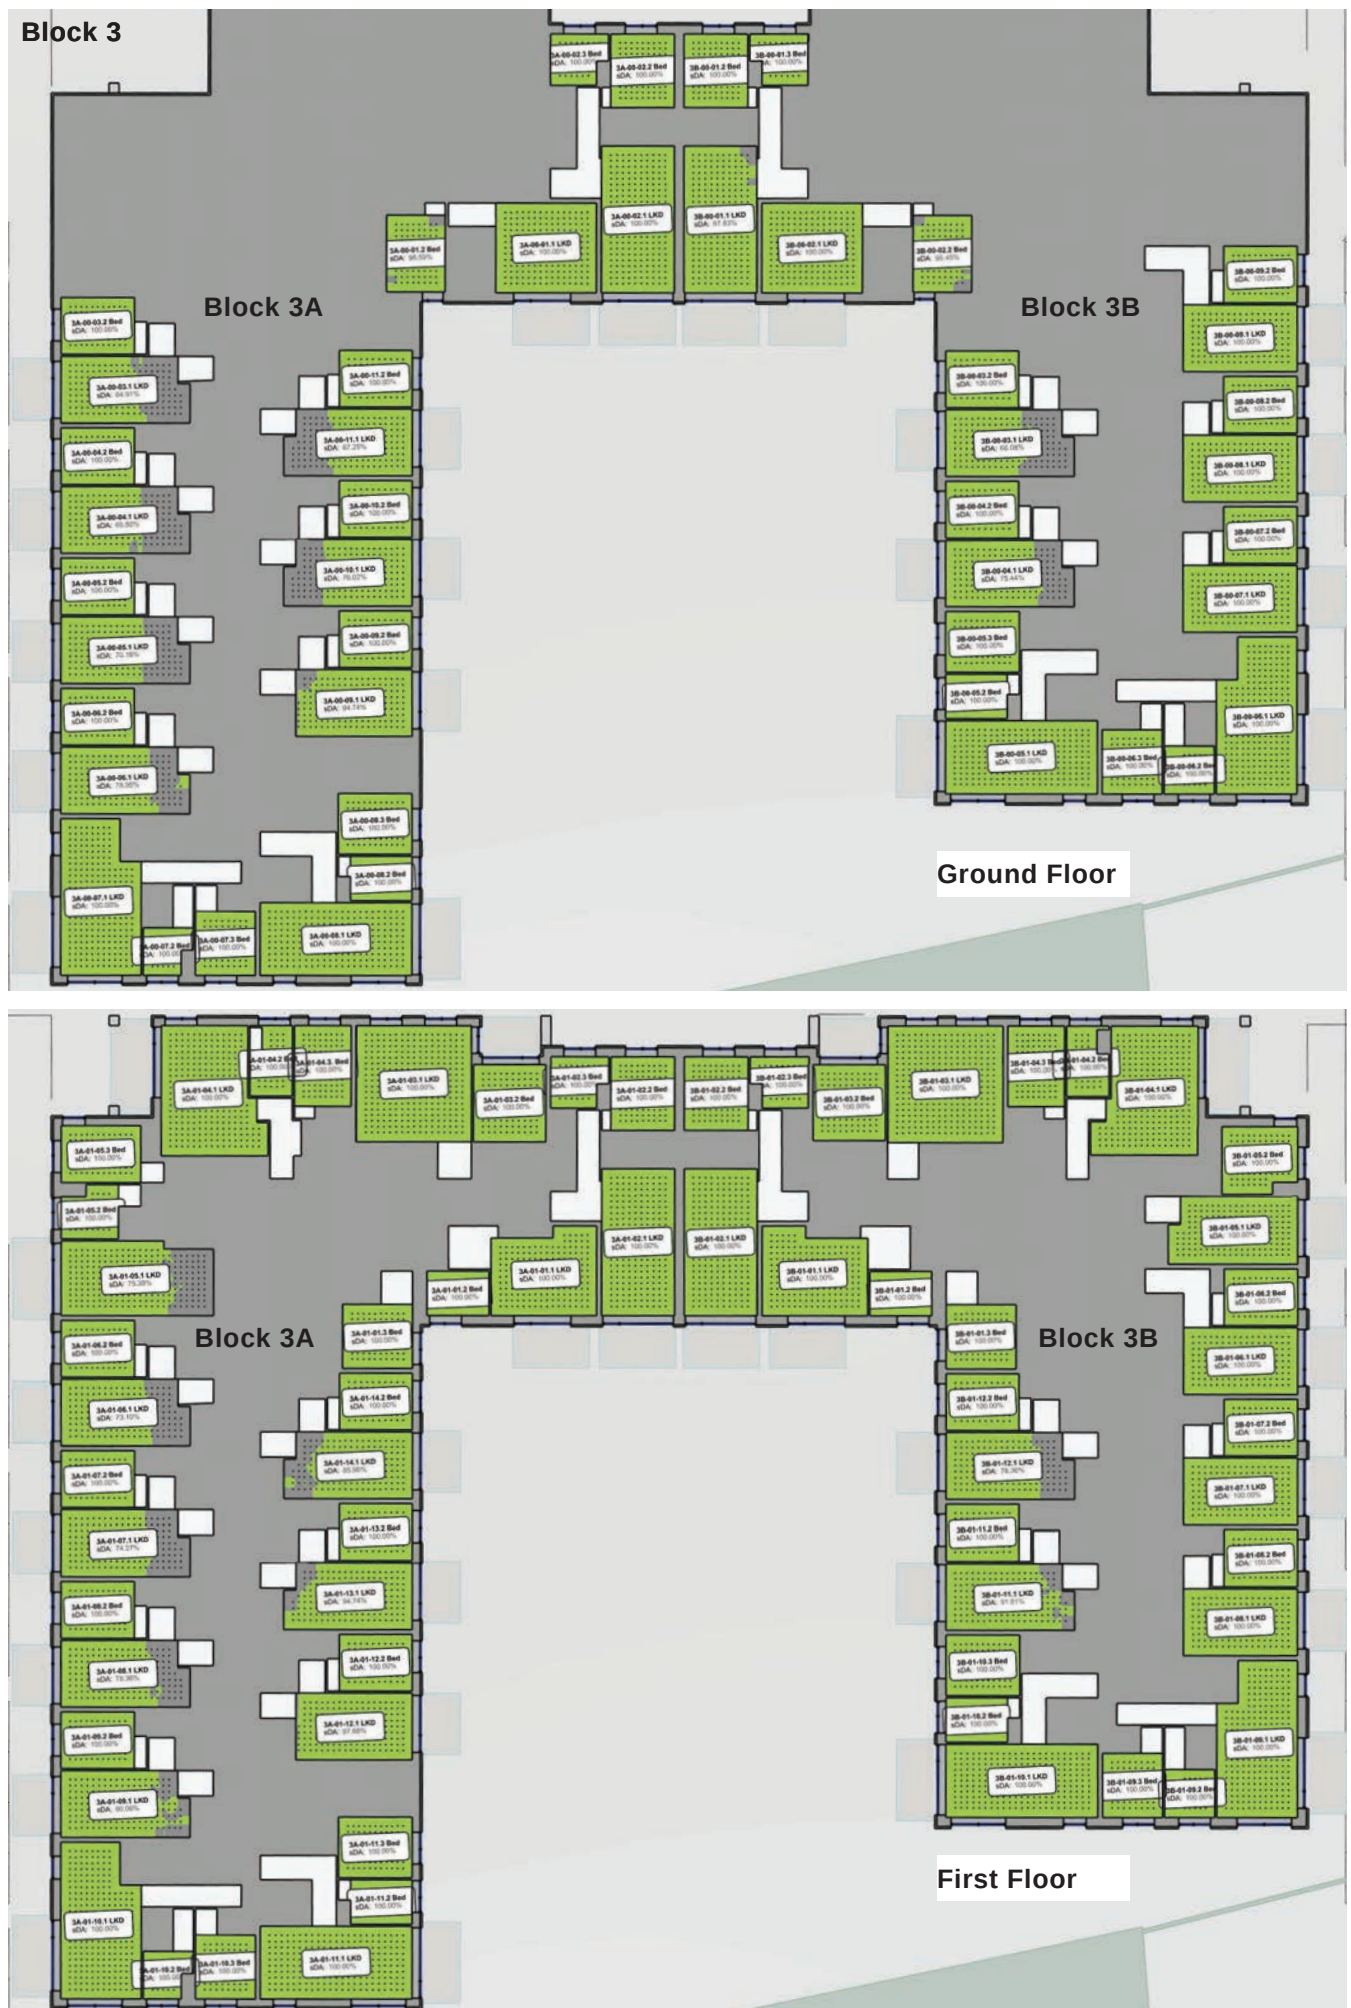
Block 3 - Floor plans indicating Daylight Provision to BS EN 17037:2018+A1:2021
